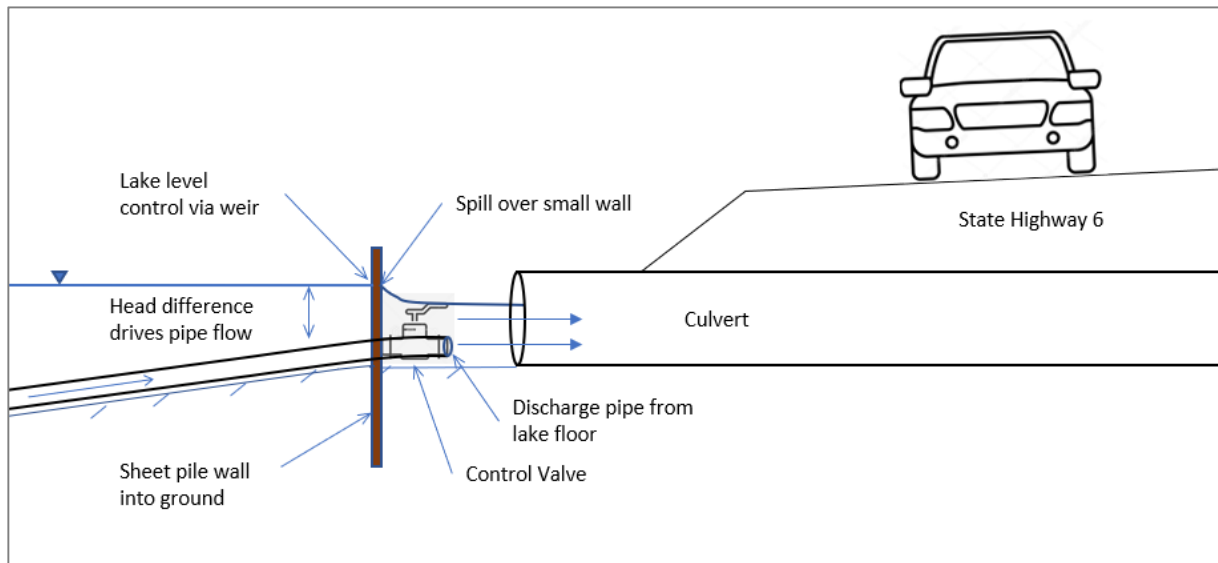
Long-section showing discharge point from the hypolimnetic withdrawal pipe, and SH6 culvert.
